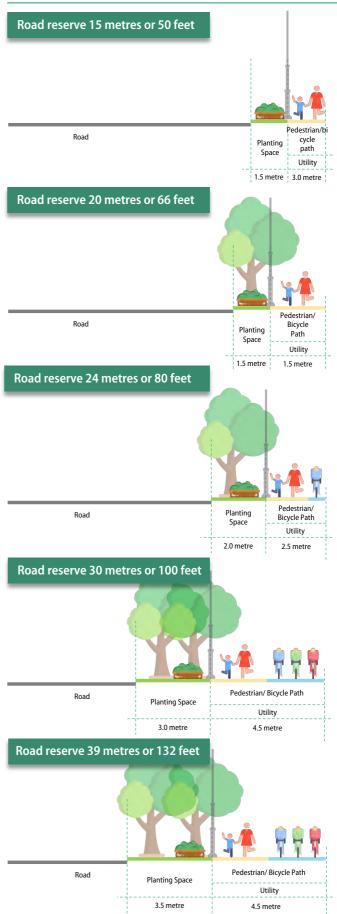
shows the minimum green space requirements to be provided based on the width of the road reserve. This implementation is also subject to detailed planning.
